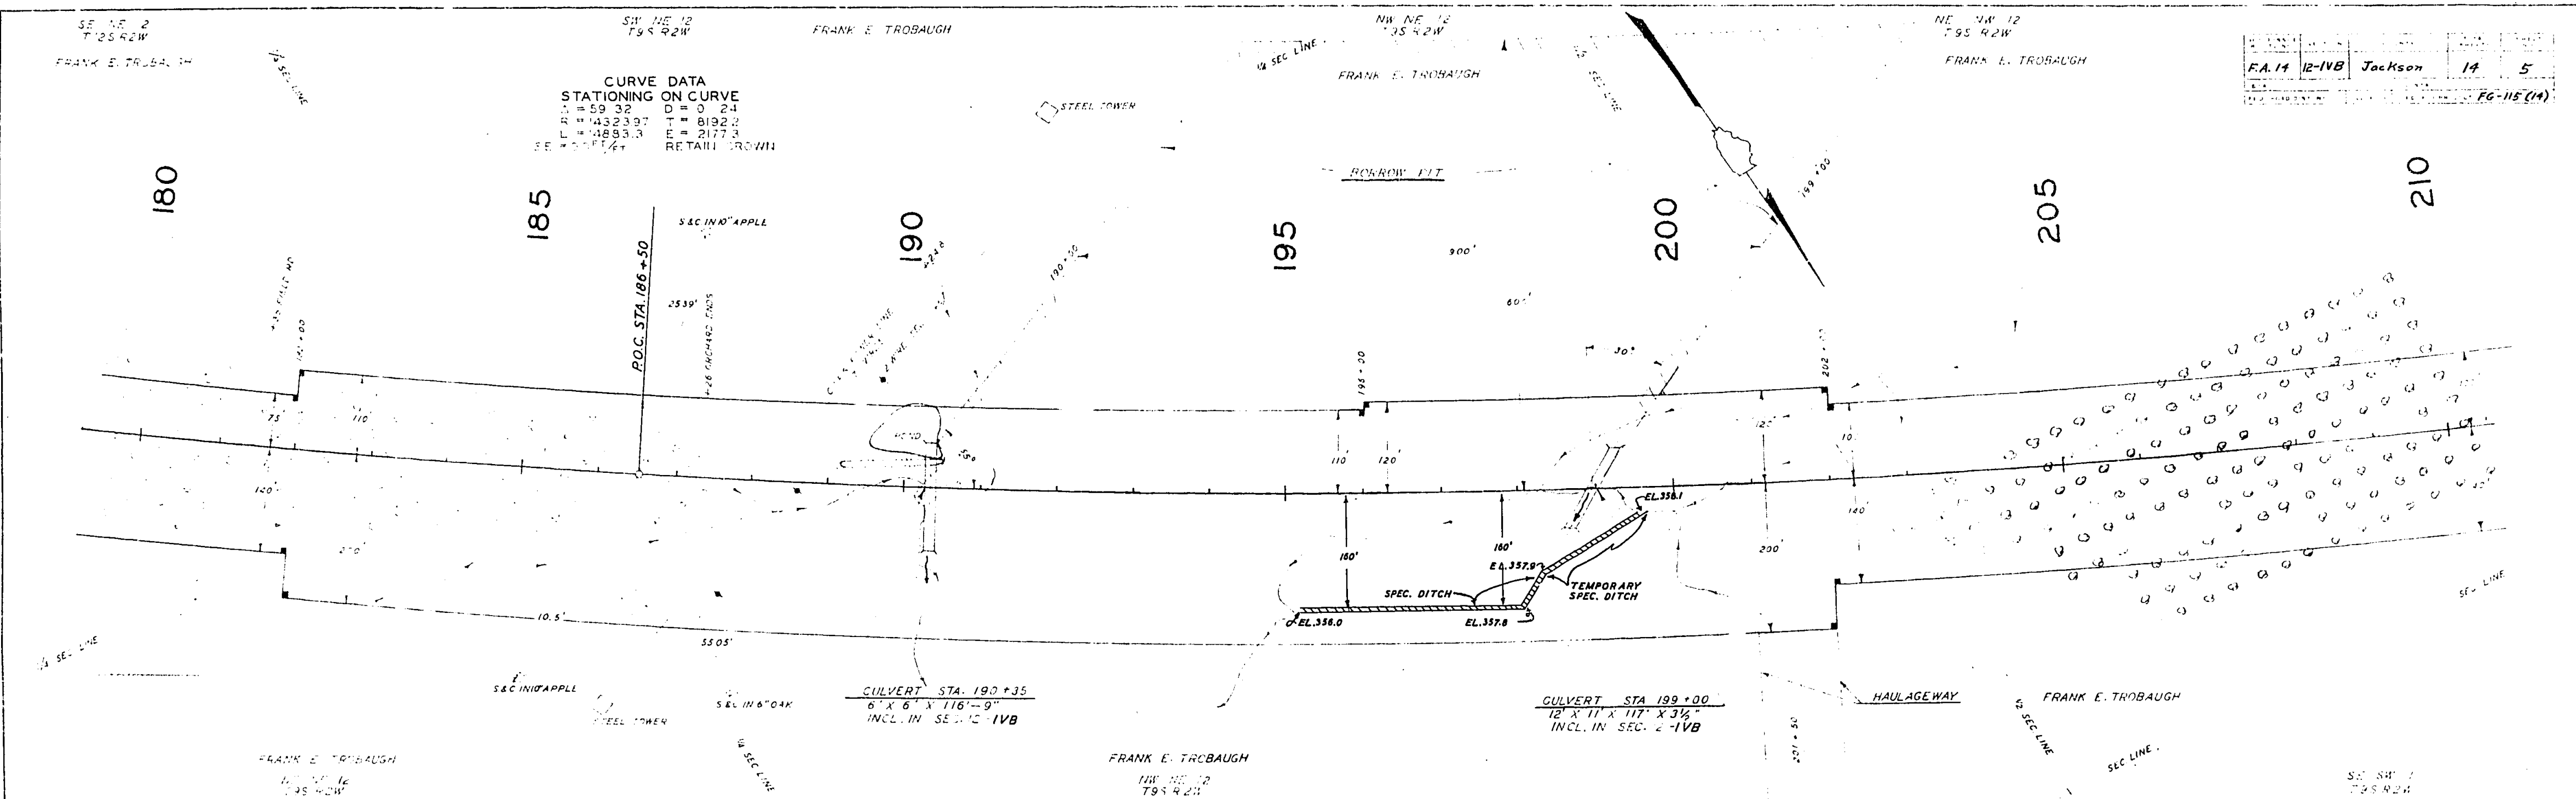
PLATE - PLAN PROFILE OF F.A. ROUTE 14
